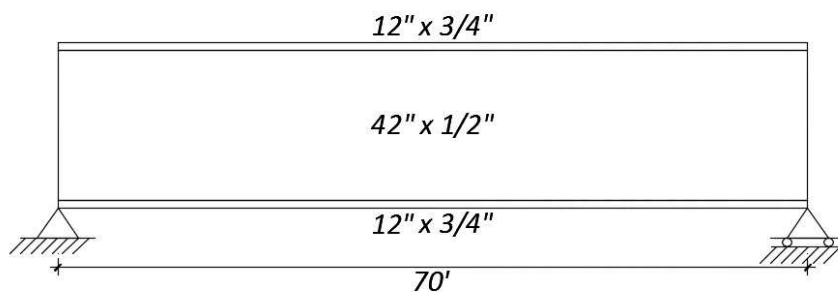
Sketch of the typical 70' one-span composite steel I-girder bridge
